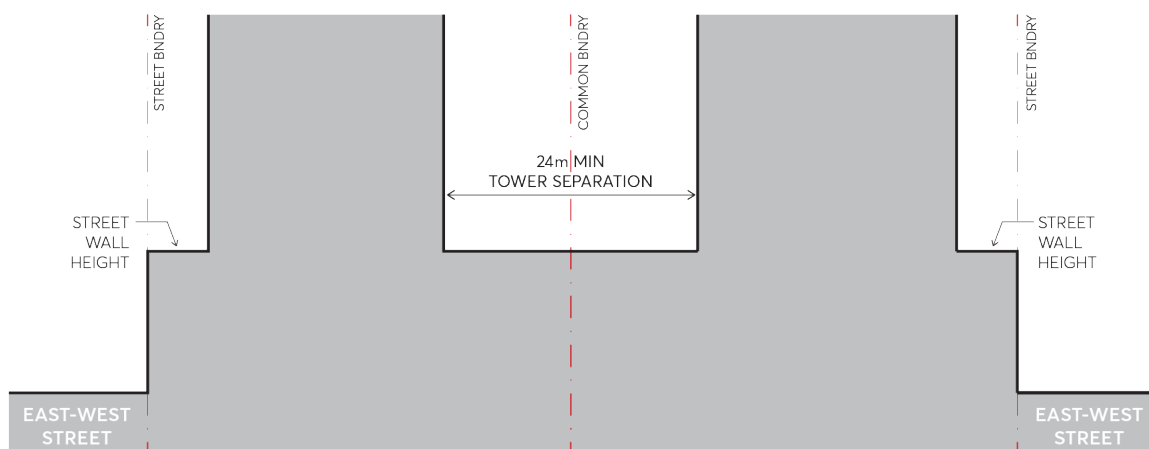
Tower separation between primarily north-south facing facades
